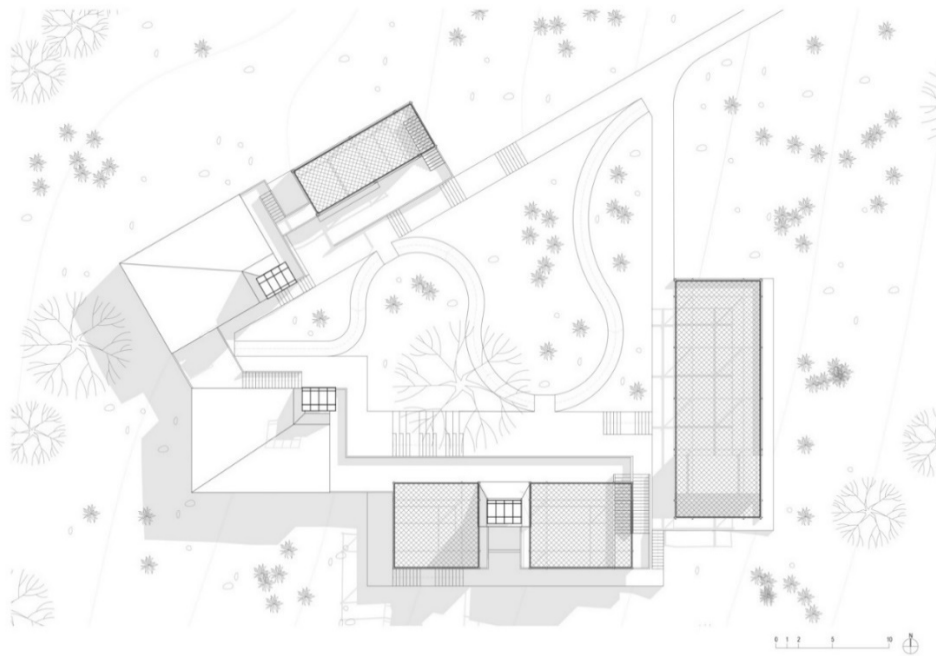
Site Plan of Startup Lions Campus (Abdel, 2021)
